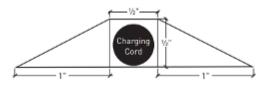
CROSS-SECTION OF RAMP REQUIREMENTS FOR UP TO 1/2 INCH
